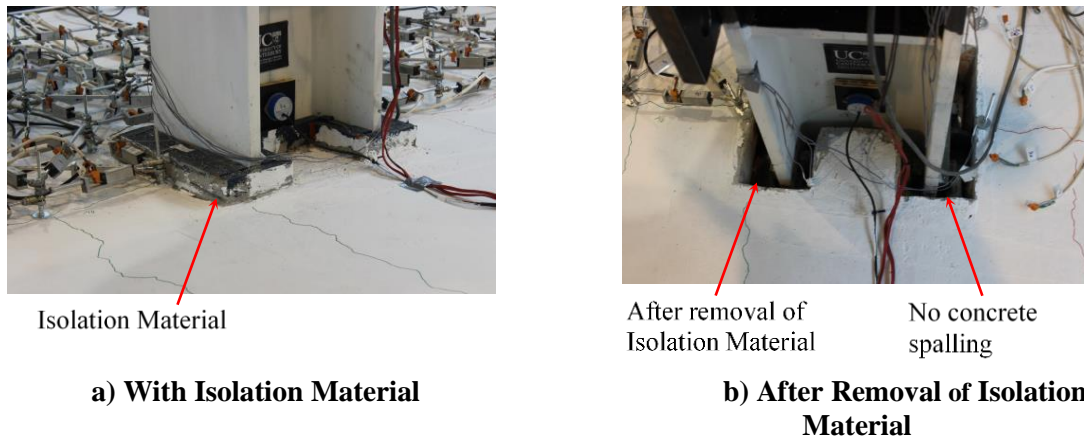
Slab Damage at Column Interaction: FI-SU Test Sub-assembly.
